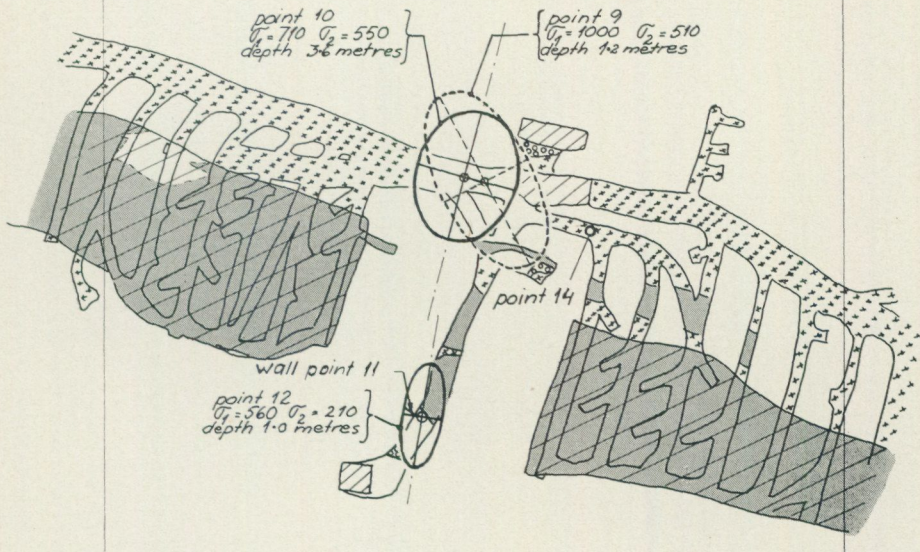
360 metre level with roof points 9, 10, 12 and 14 and wall point 11.
